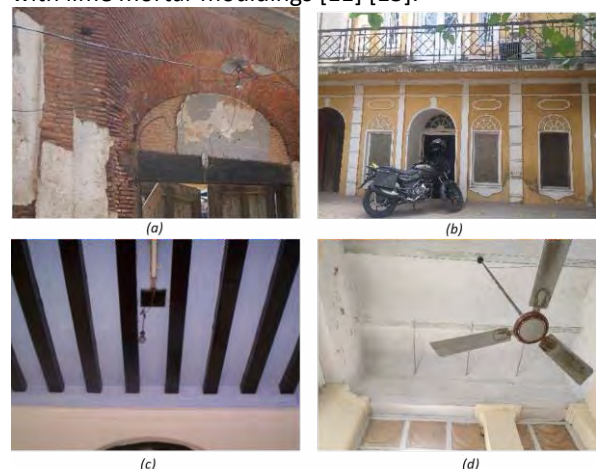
(a- Masonry wall of Lakhauri Bricks [11], b- Windows with lime mortar mouldings, c- Roof made of Timber Beams [11], d – Vaulted Ceiling Roof)
